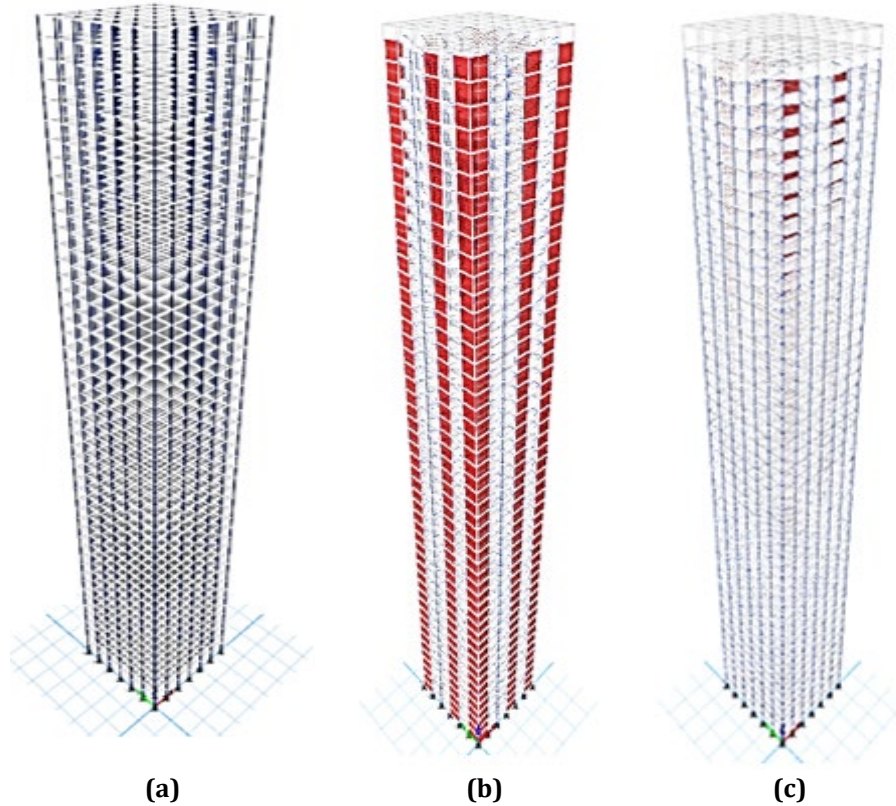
High-rise building without shear wall (a); shear wall at the corner (b); and at the center (c)
